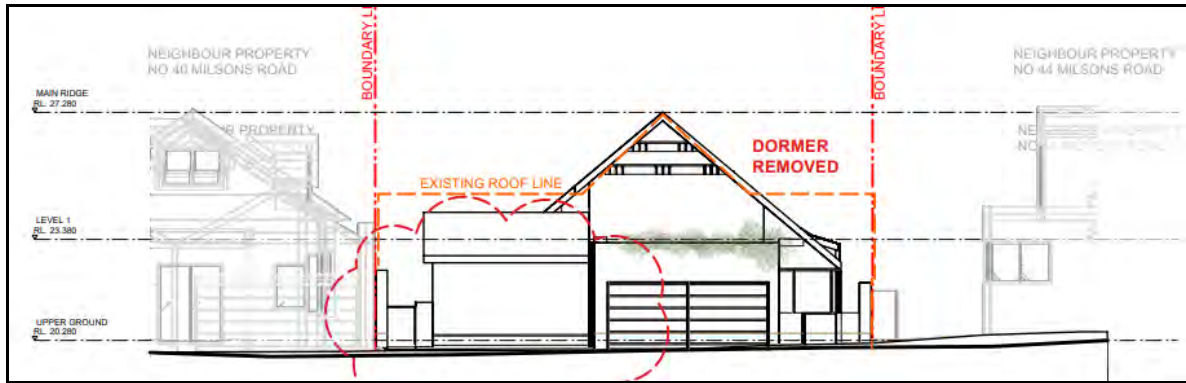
Proposed North Elevation, DA-A-200 Rev L
